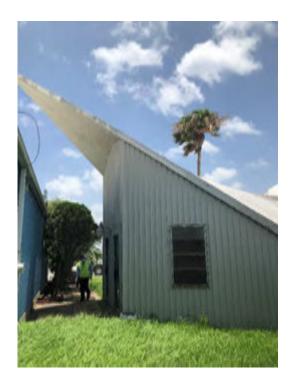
Concrete roof structure of Gault Hangar overhanging an adjacent office building.
